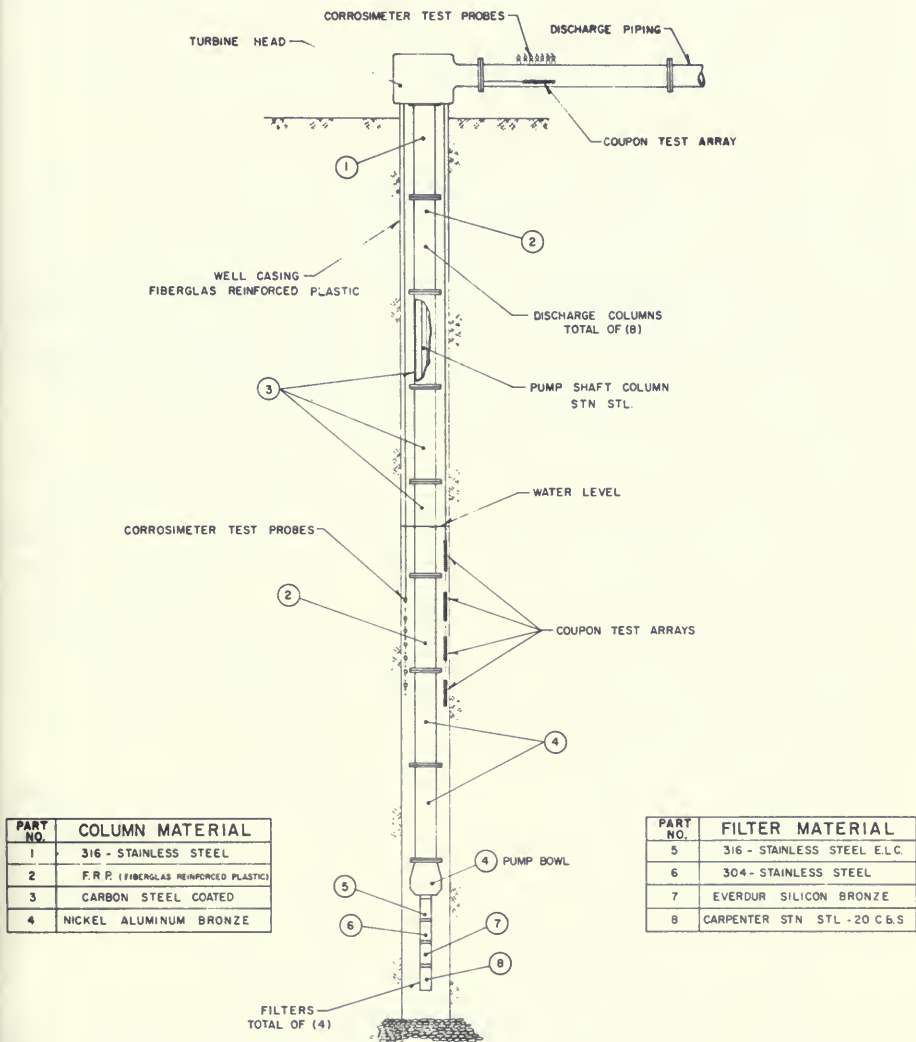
TYPICAL TEST PROBES & TEST ARRAYS INSTALLATION
